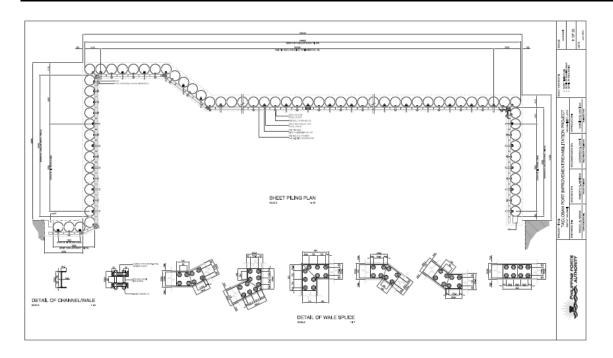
Piling Plan of Steel Pipe Sheet Pile (SPSP)
